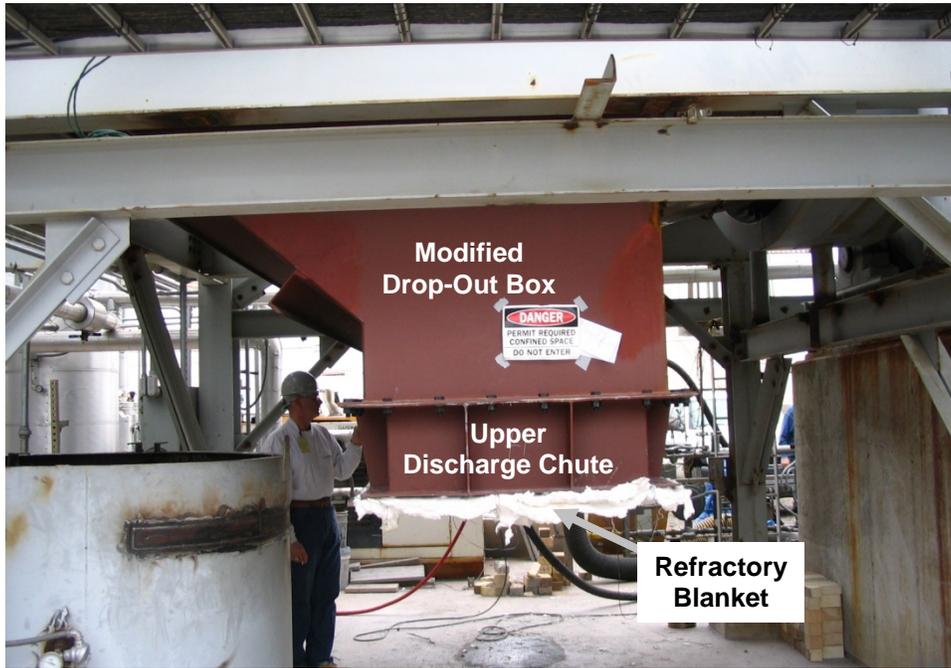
New Drop-Out Box and Upper Discharge Chute in Place with Refractory Blanket Shown at Bottom
